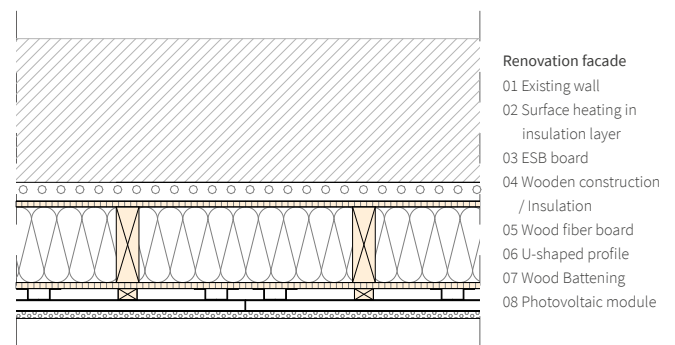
Horizontal Section Renovation Façade / M 1:20
